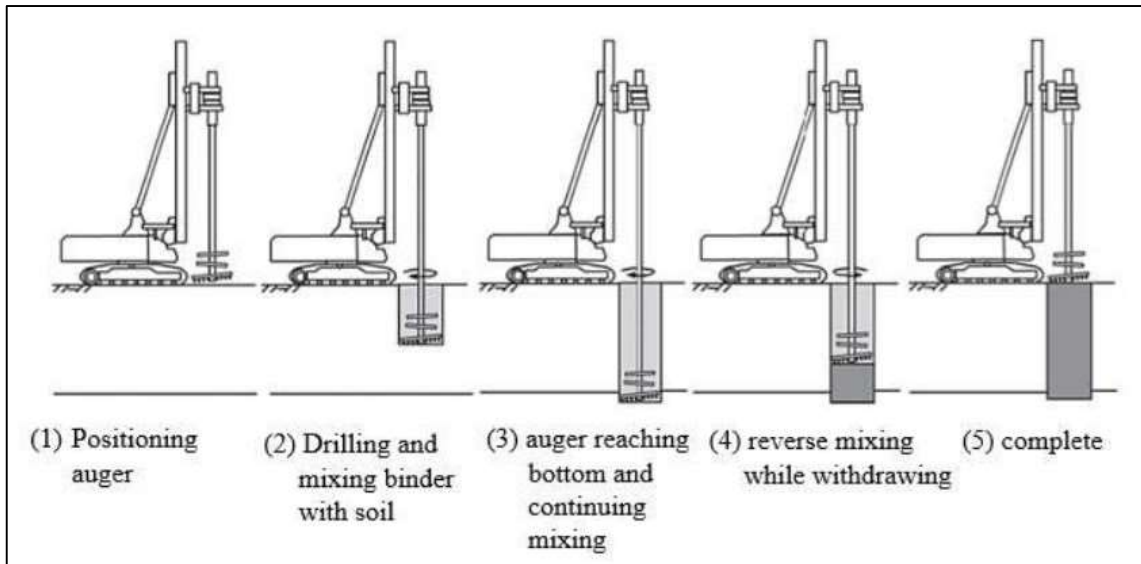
Deep mixing column installation process (Keller, 2013)
